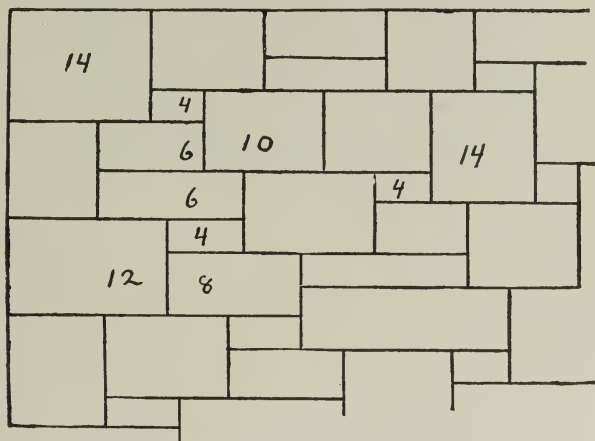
Broken-ashlar Stonework (Six Sizes).
